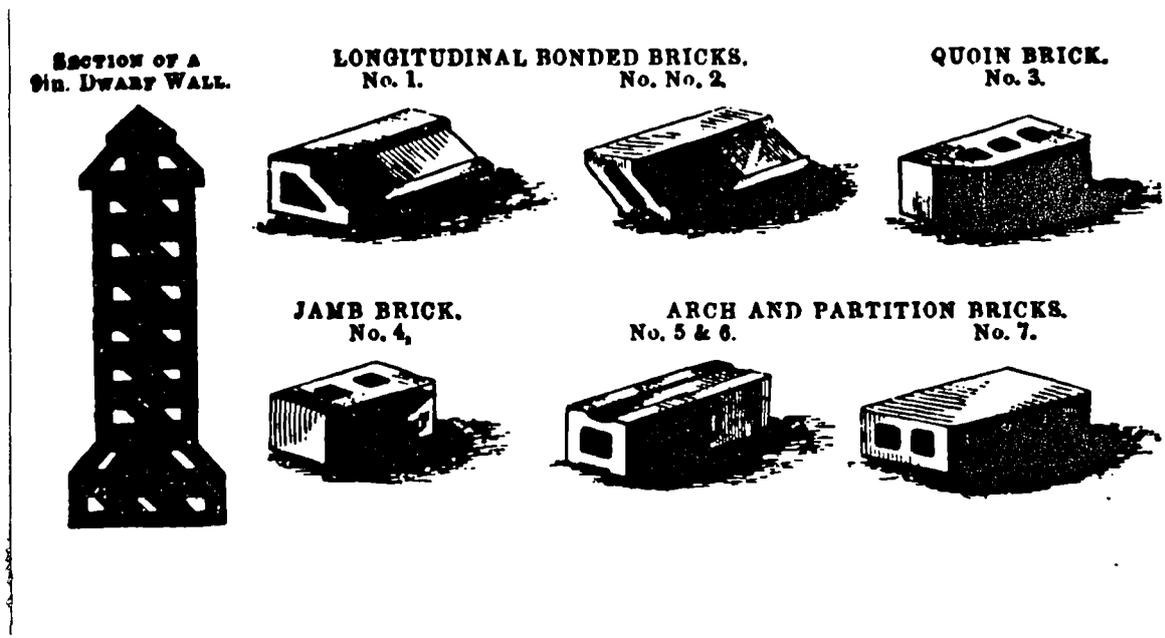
Sections of wall built with Henry Roberts' Patent Bonded Hollow Bricks.
